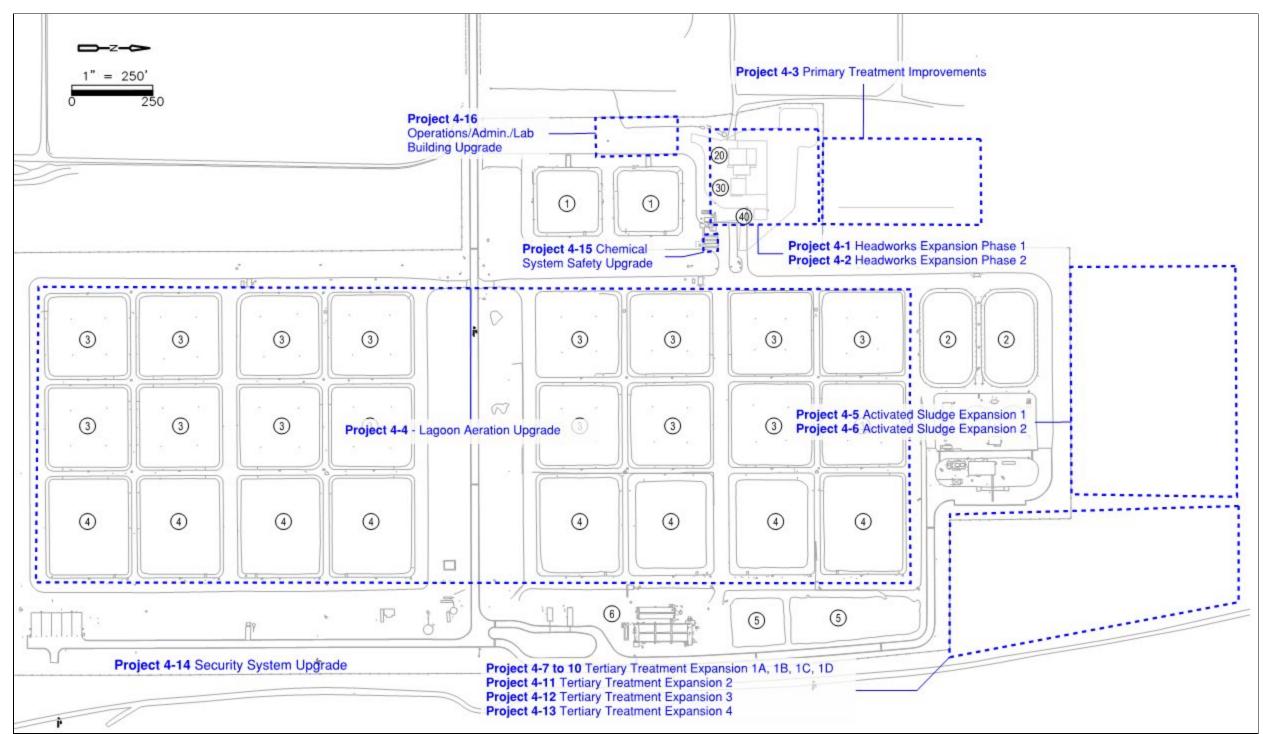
WRP 4 Existing Site Plan and Proposed Improvements
